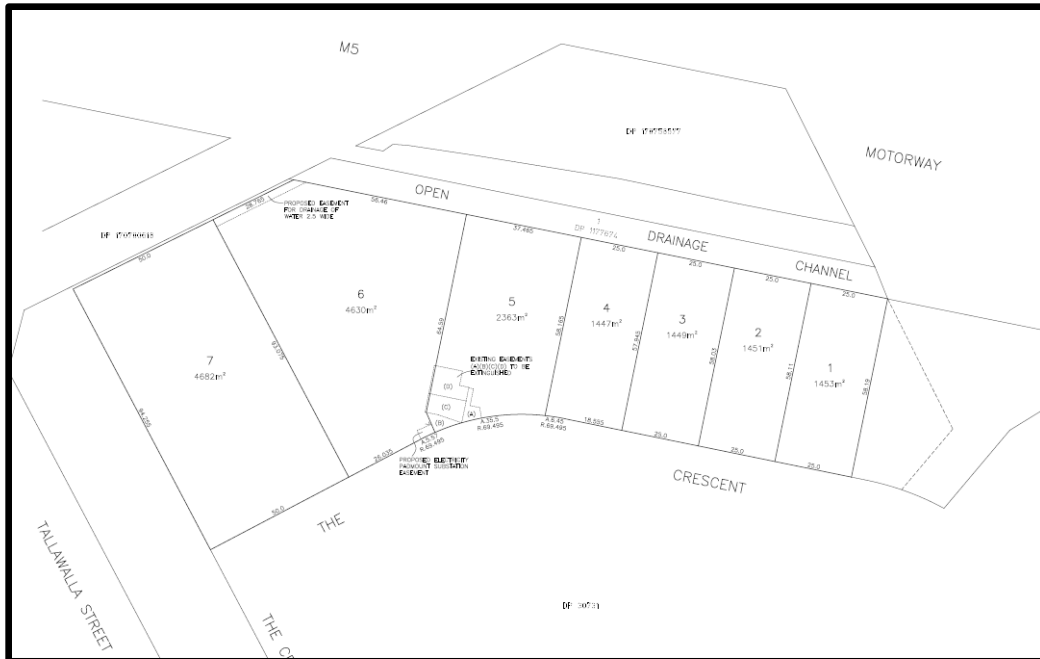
The subdivision plan of the adjoining allotments to the west, No.2 The Crescent, Kingsgrove
